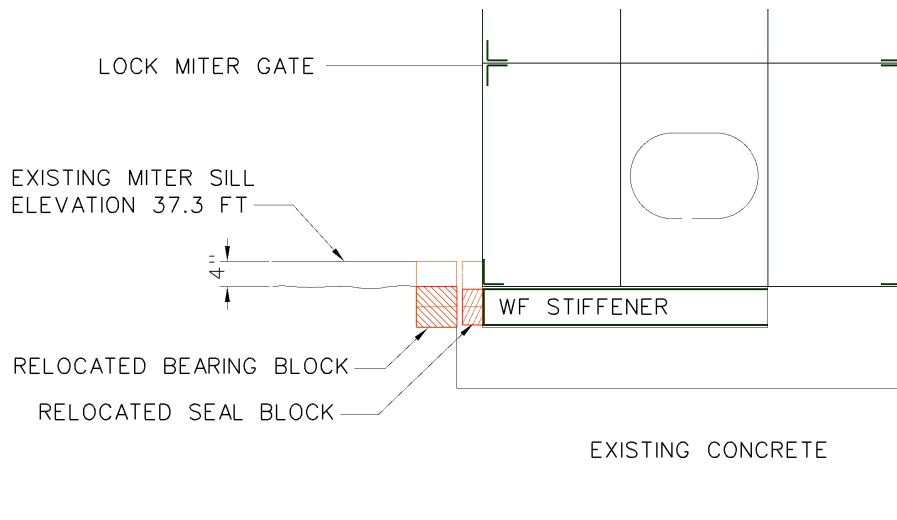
1 Typical Lock Gate Sill Lowering Detail
